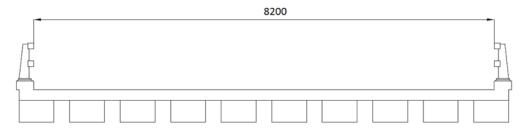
Typical Proposed Cross Section for Church Creek Bridge
